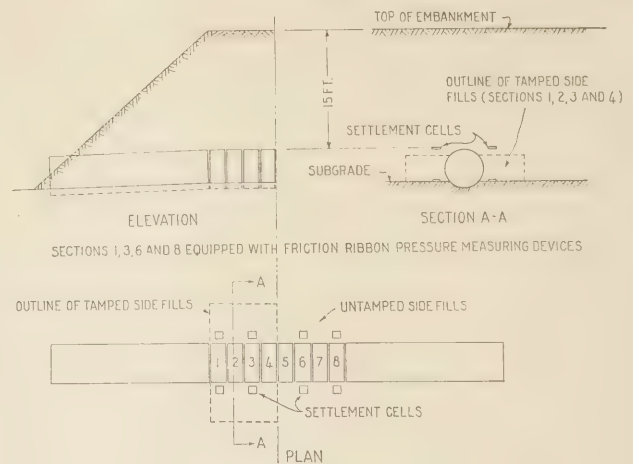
LAYOUT OF CULVERT INSTALLATION AND TESTING APPARATUS.
